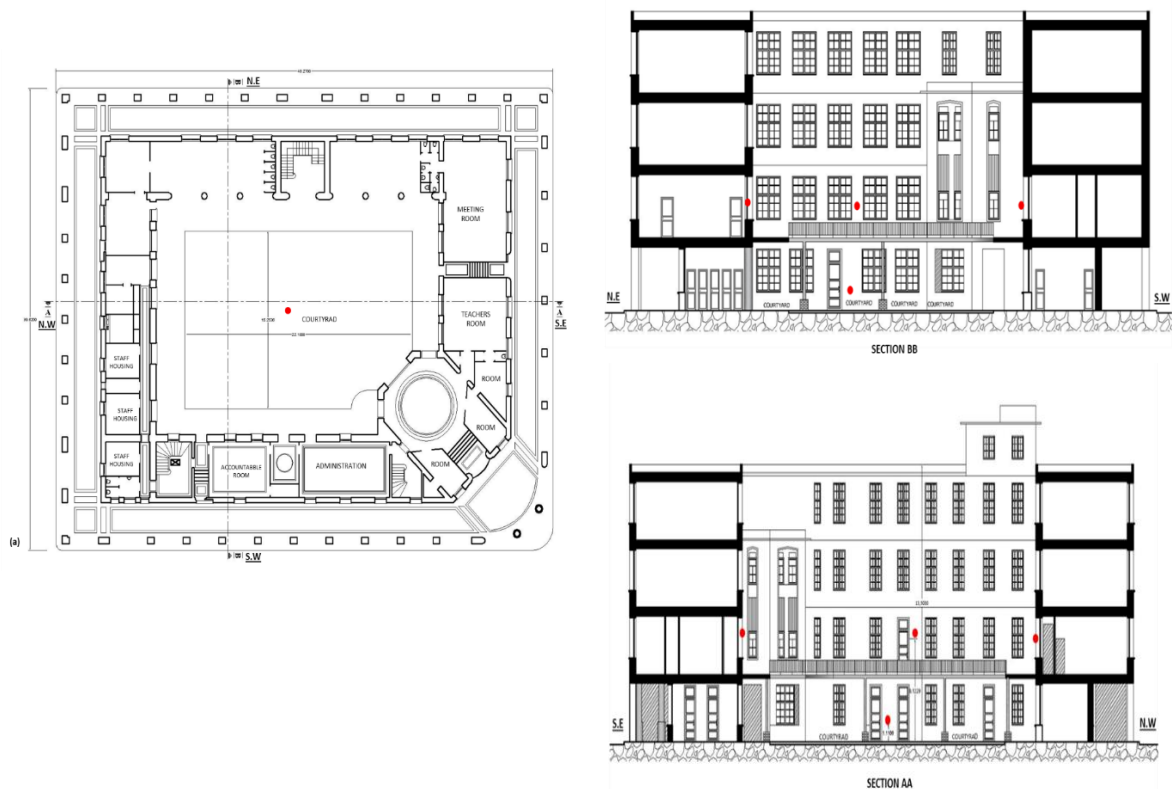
Ground storey plan and sections of the courtyard building with measurement points (Dimensions in metres, drawing at 1/100 scale). Source: College authorities (2021)
